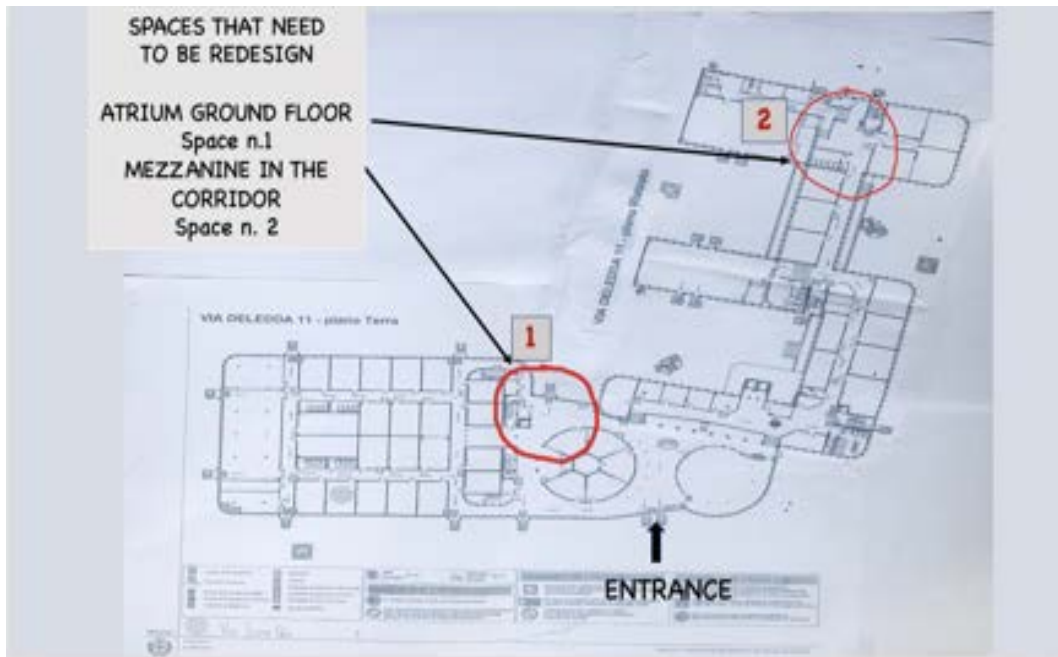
SPACES TO REDESIGN. SPACE N. 1: ATRIUM – GROUND FLOOR; SPACE N. 2: CORRIDOR – MEZZANINE
